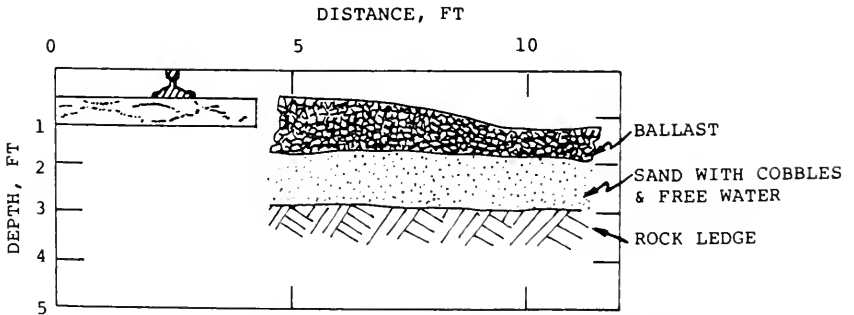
Transverse Cross Section at Site 2, Cross-Hole 2
